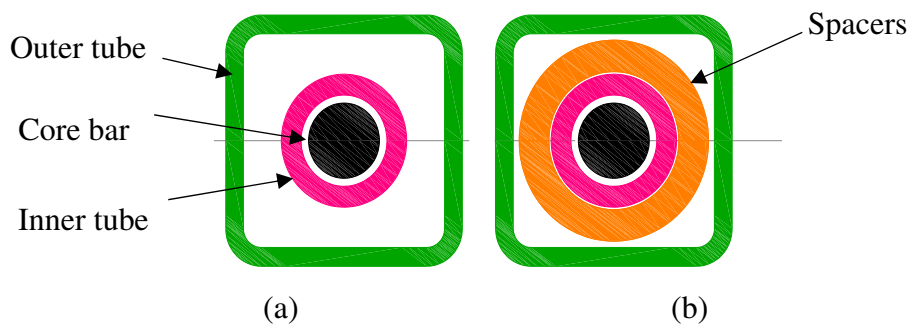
Proposed BRB: (a) General cross section, (b) Section including spacers
